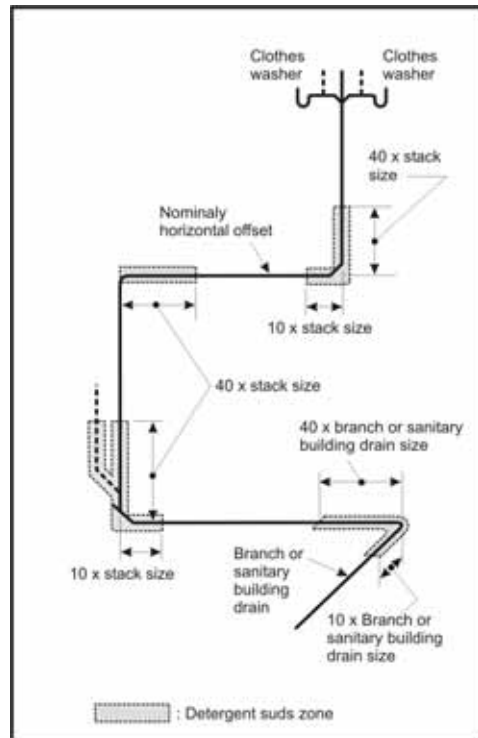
(7) Suds Pressure Zones Connections.”;
